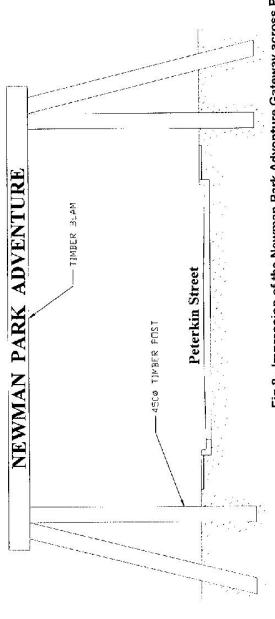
Impression of the Newman Park Adventure Gateway across Peterkin Street
